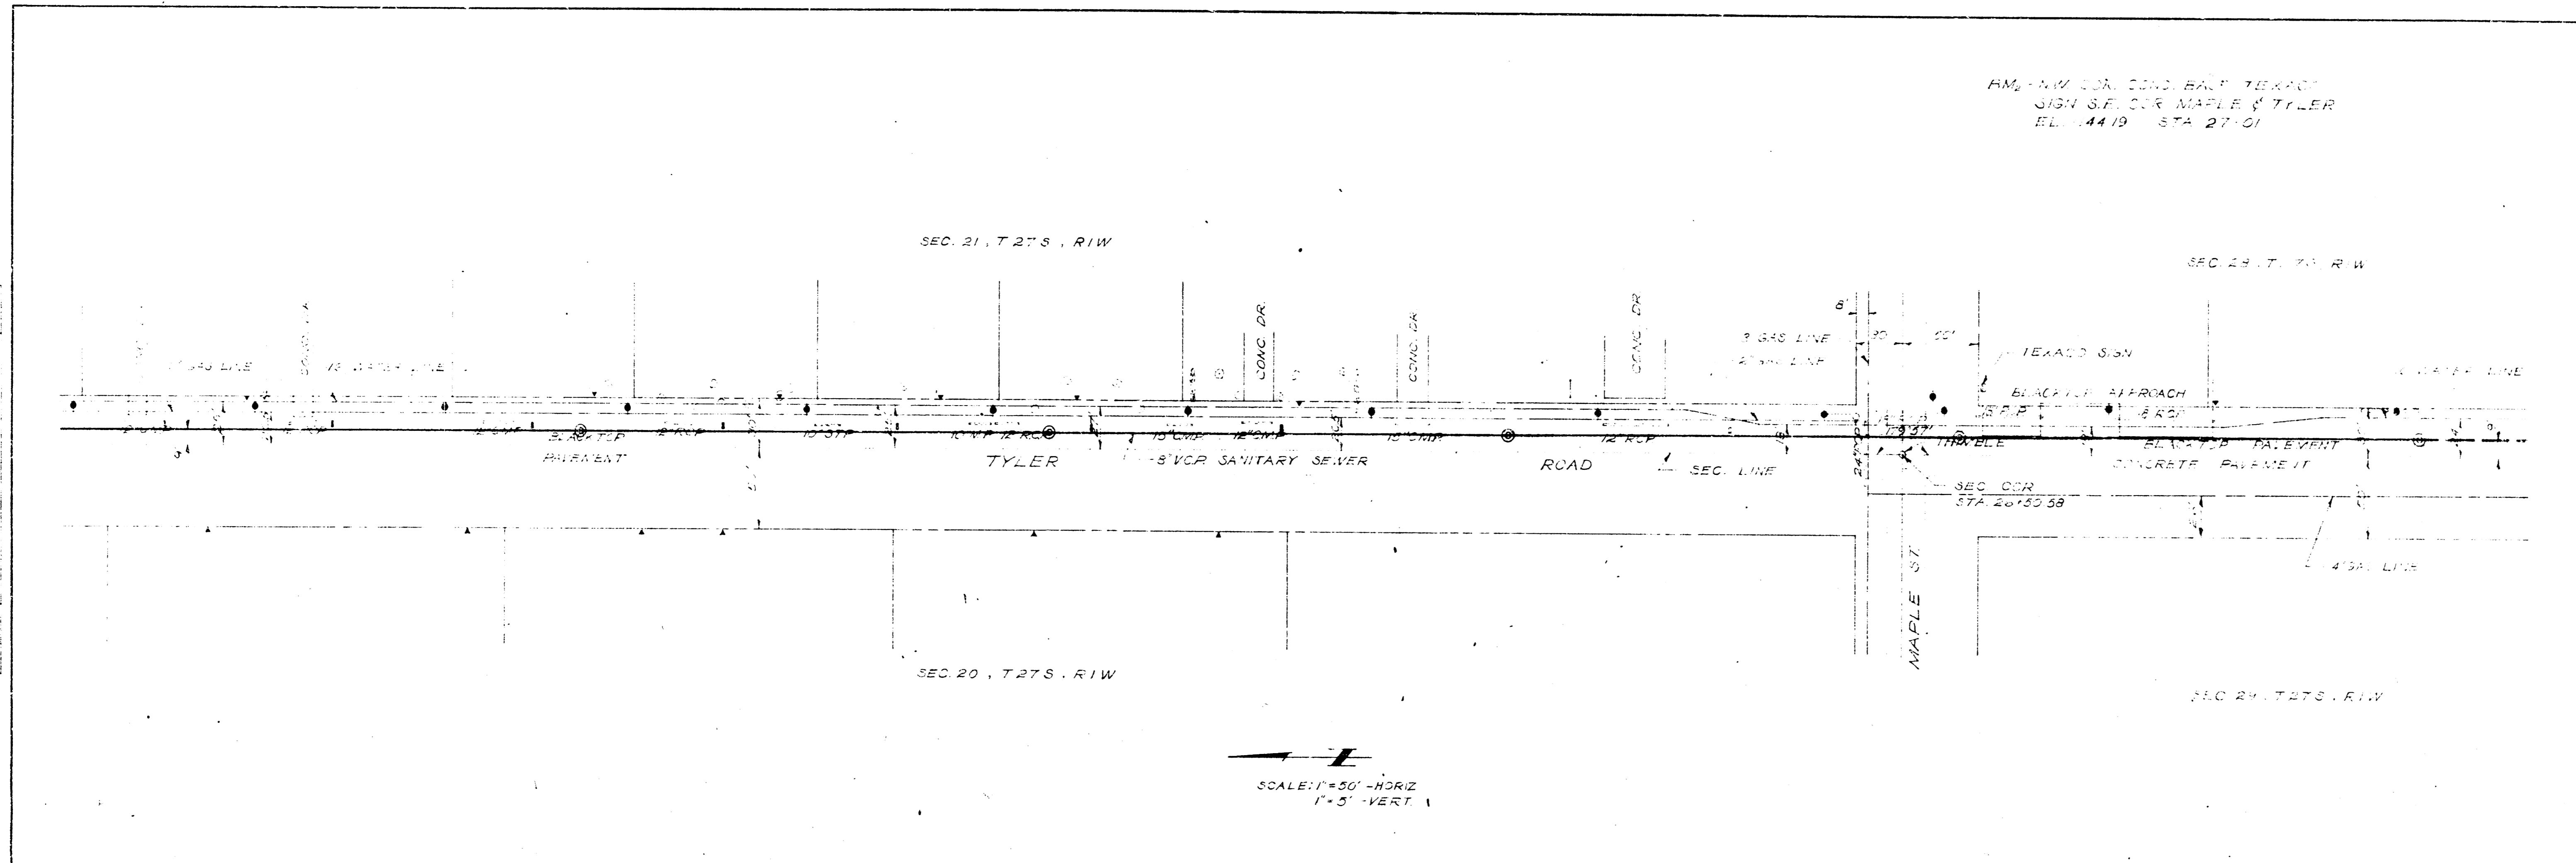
PLAN - PROFILE D.P.S. & E. STANDARD
